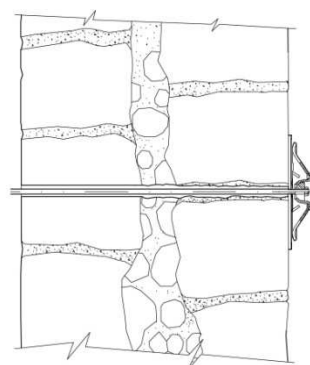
Cross section of a retrofitted masonry wall with a ductile anchor plate
